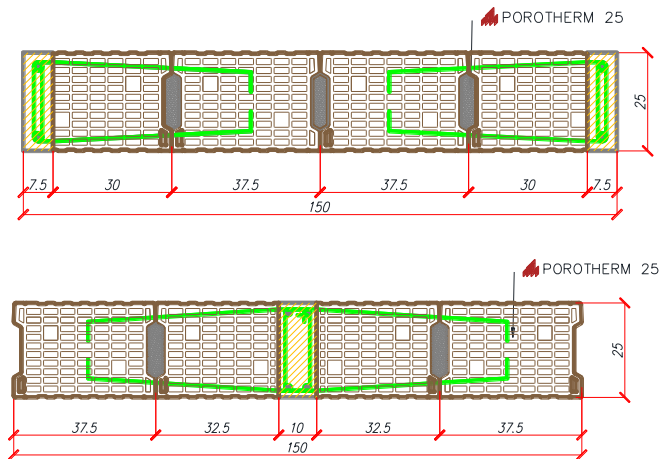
Reinforcement position for the masonry walls RM1 and RM2
